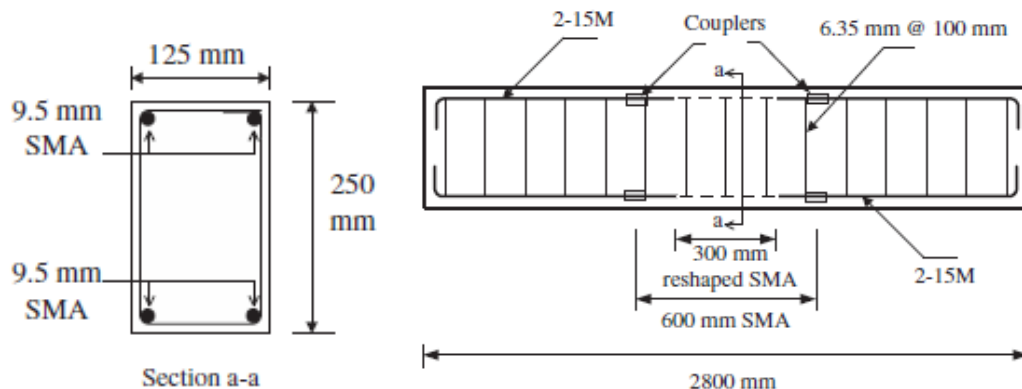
Details of the specimens (section and reinforcement arrangement) [14].
